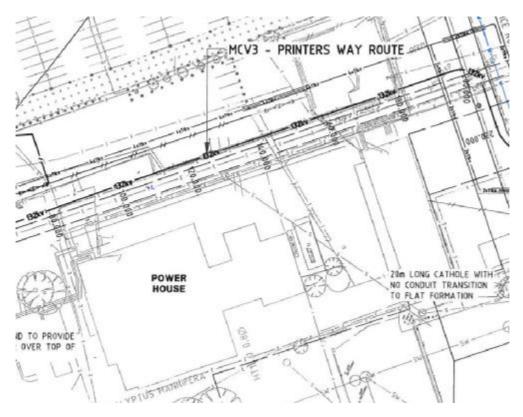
Detail of drawing showing 132kV relocation works in proximity to the Power House, 2003. North is at left. Source: Kingston Foreshore, 132kV Relocation Works drawings, SMEC, detail plan, drawing no.32108/508, 21 May 2003.
